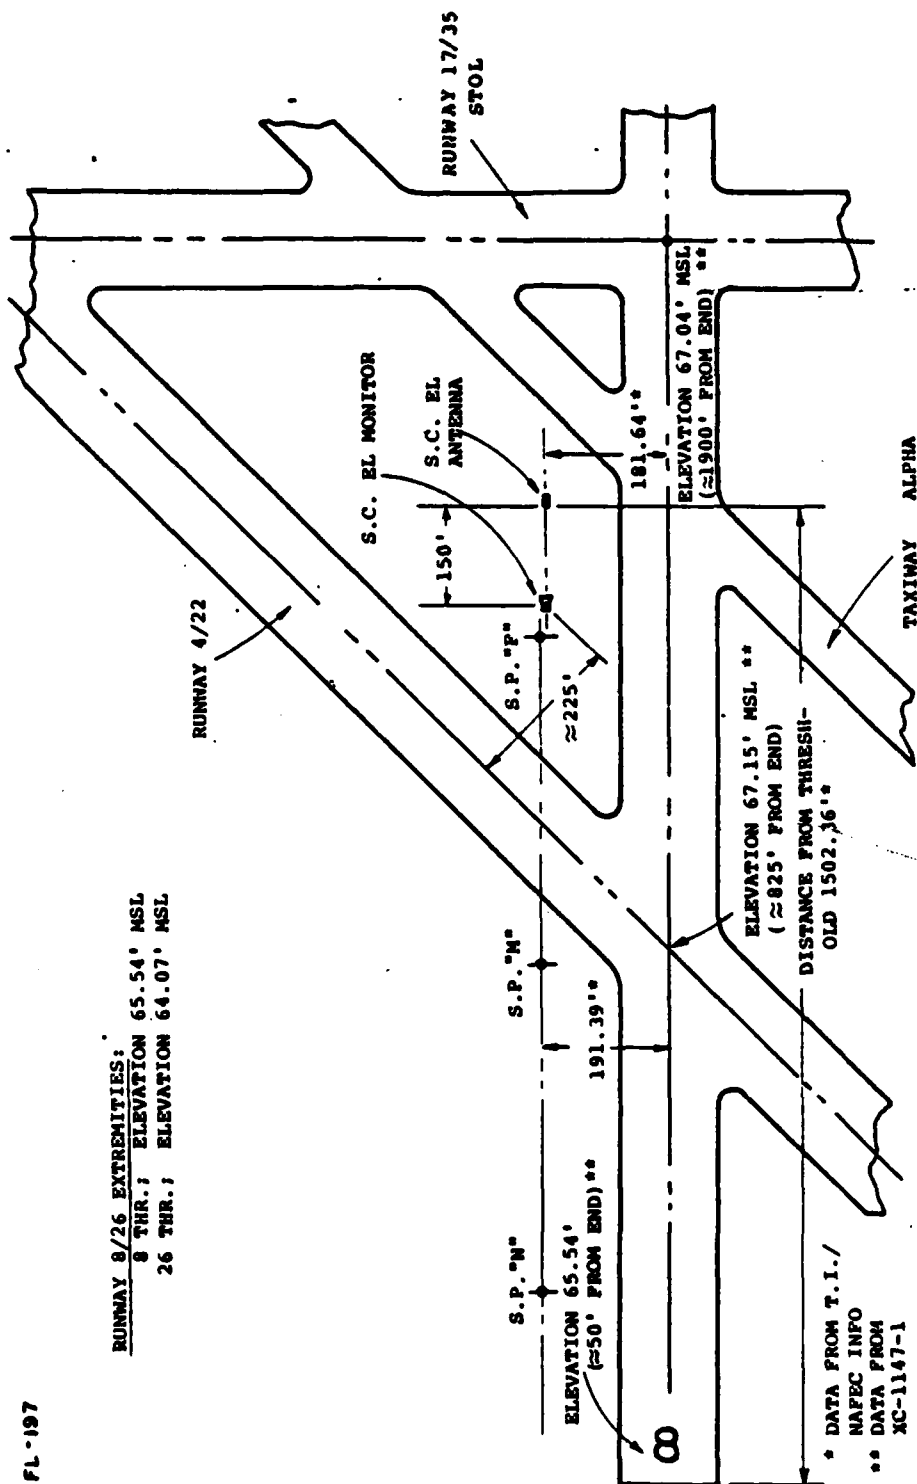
SC EL SITING (PLAN VIEW), RUNWAY 8
